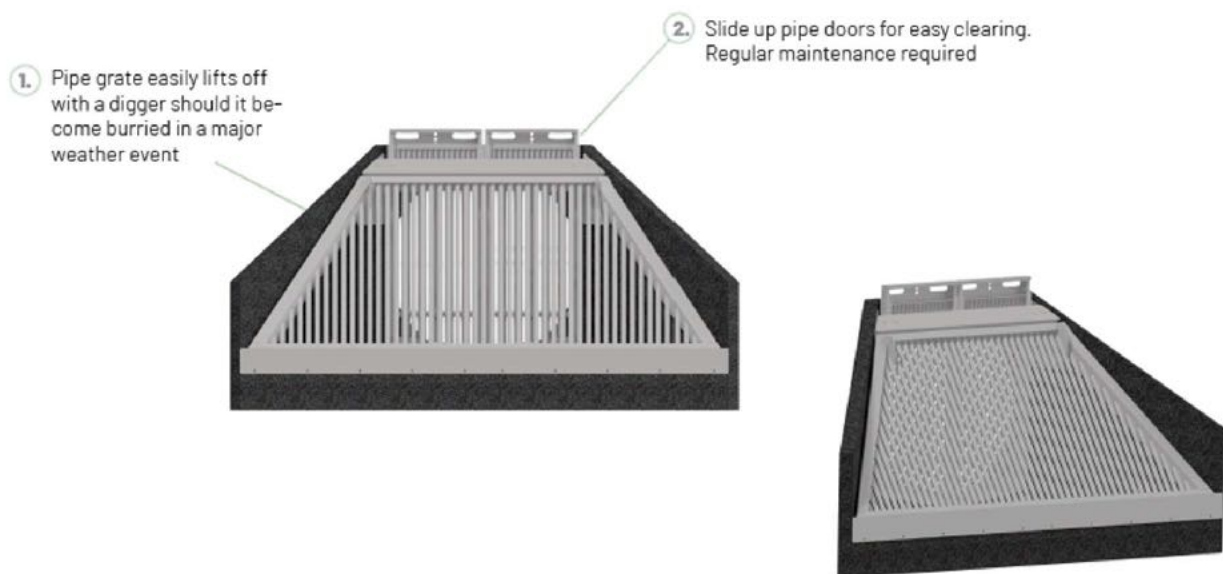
A typical inflow culvert, involving a pipe with a screened wingwall at the inflow end. The wingwall is positioned on the 'outer' side of the fence, and prevents pests moving through the drainage pipe into the protected area.
